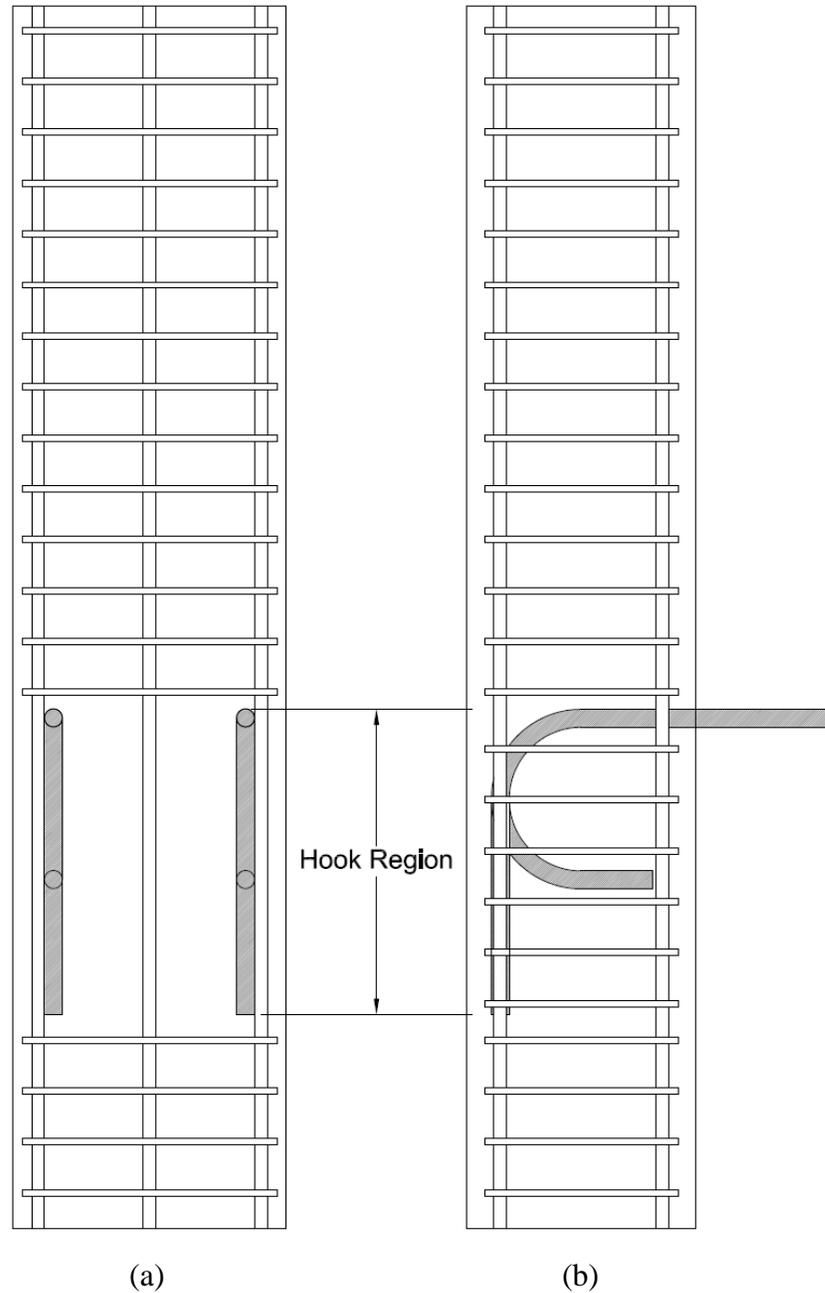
Schematic of specimens (a) front view of specimen with hooks inside column core and no confining transverse reinforcement (b) side view of specimen with hooks inside column core and No. 3 ties spaced at $3d_b$ as confining transverse reinforcement
